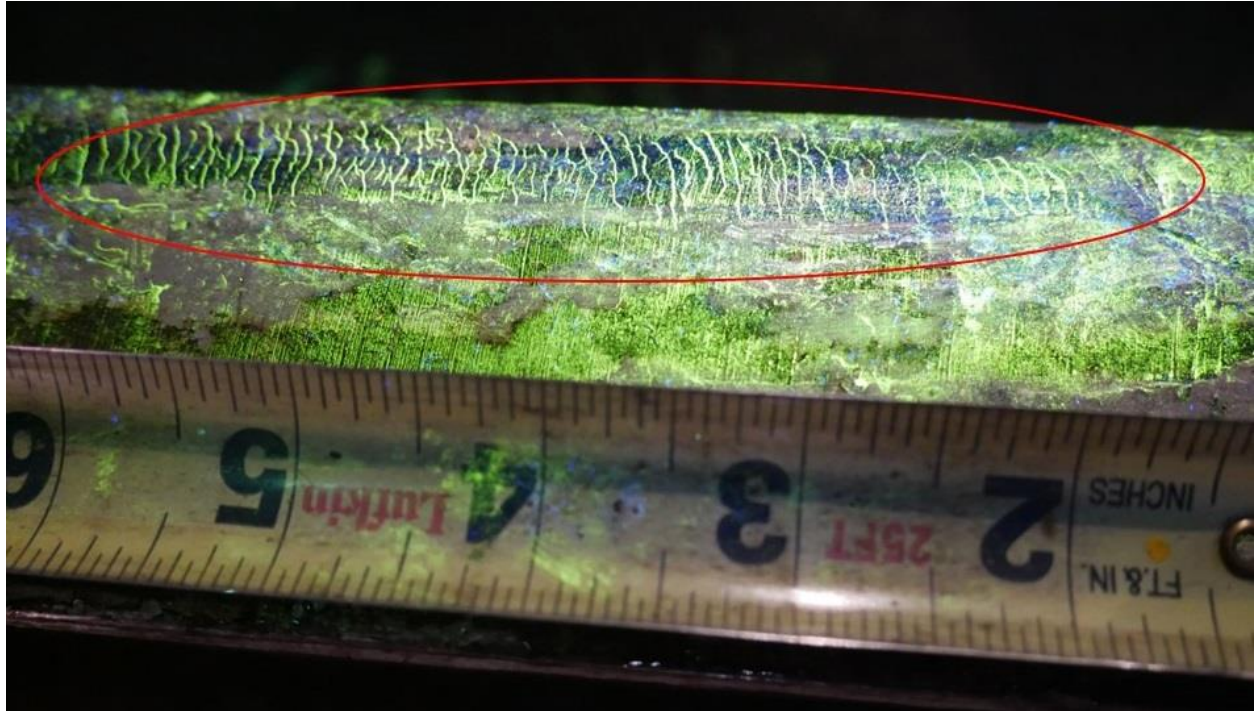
The gauge corner cracking revealed by MPI along the gauge side of the rail.
